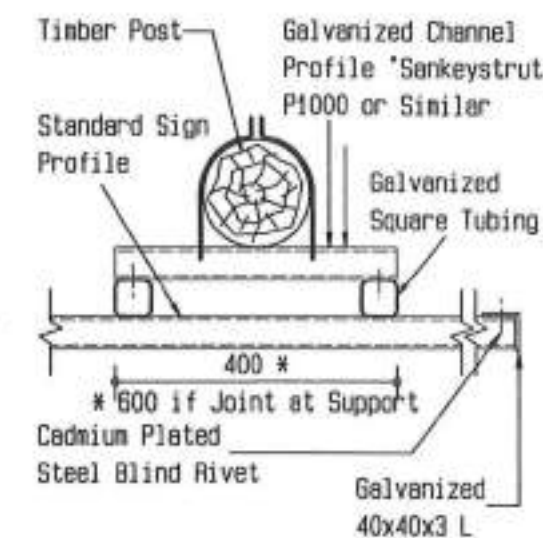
Ground Mounted Road Sign Back Plate consisting of Stacked Chromadek Road Sign Profiles
